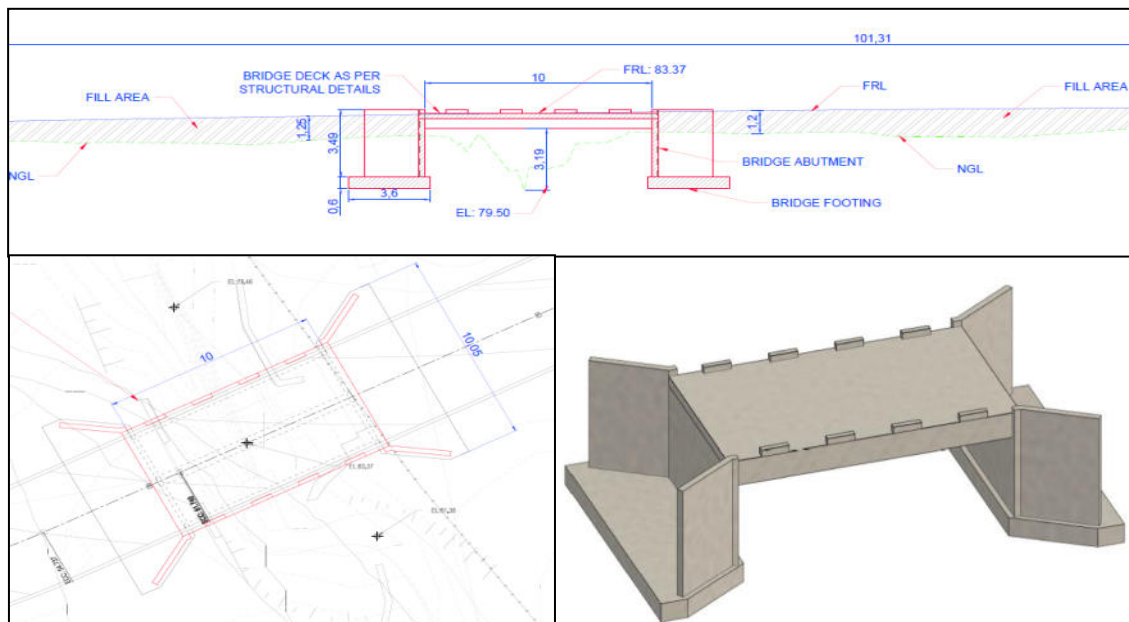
Proposed bridge structure (preferred alternative). Source: Ekcon Engineers and Project Managers, 2022 (Appendices B1).
